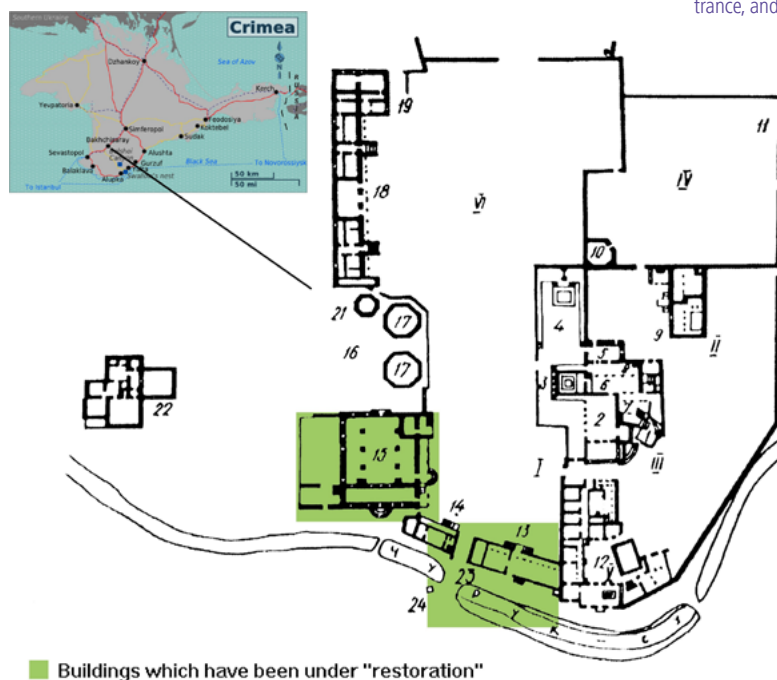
General plan of the Crimean Tatar Khan's Palace in Bakhchysarai (1983) with buildings damaged by unprofessional "restoration". 13, 14 - Retinue or Count's Building, 15 - Great Khan Mosque, 23 - embankment with three bridges, 24 - the Milestone of Katherine the Second, VI - the main courtyard.
